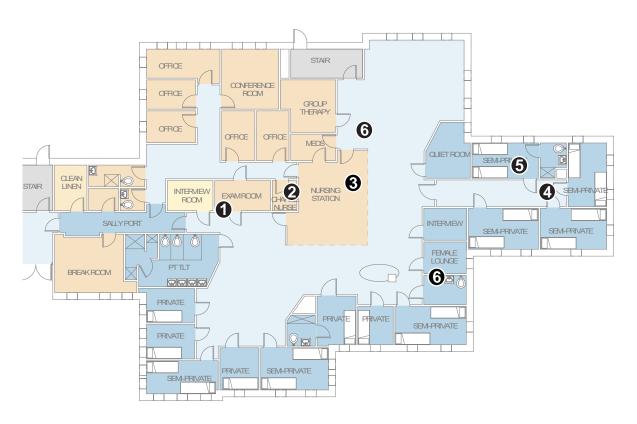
VA Central Western Massachusetts, Floor Plan
